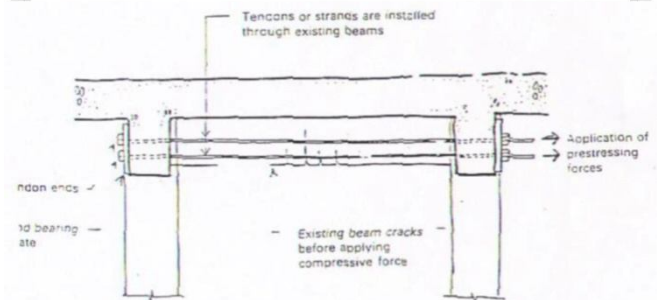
Application of external prestressing for tensile cracks
